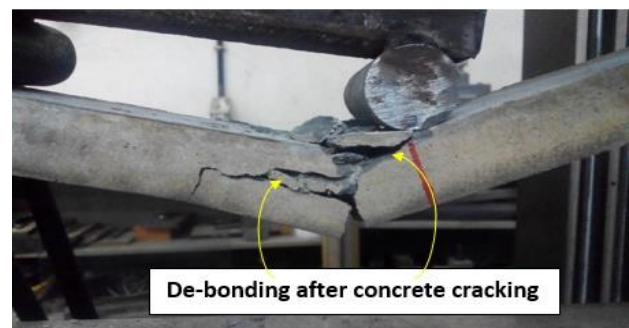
Comprehensive failure of concrete beam reinforced with two layers of textiles impregnated partially by epoxy
